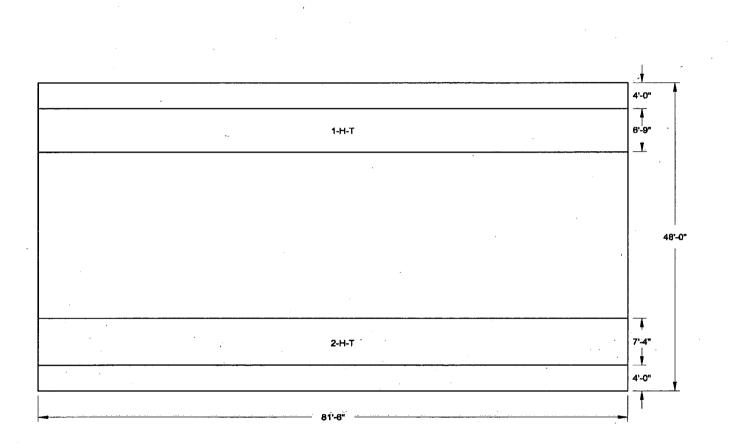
H 8-146: SLAB 1 LOOKING DOWN TRANSVERSE REINFORCEMENT ZONES
